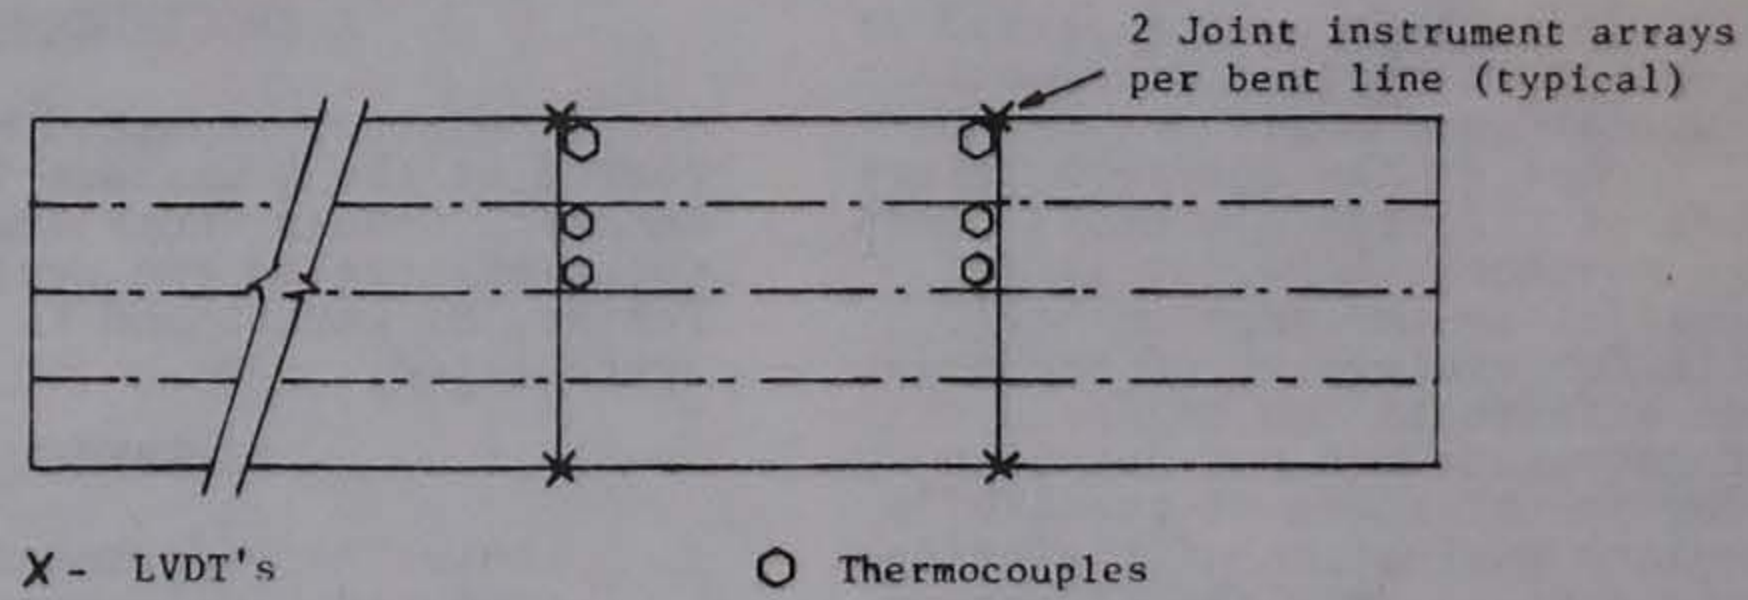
Layout of Joint Instrumentation Arrays at a Bent Line and Location of Thermocouples
